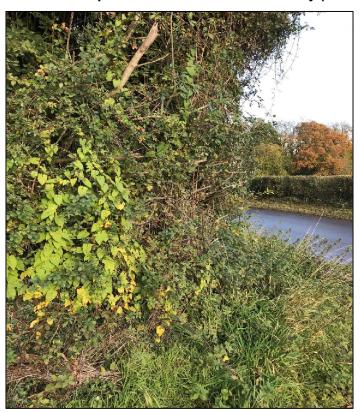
Proposed Access Junction – Visibility (Looking Right)
